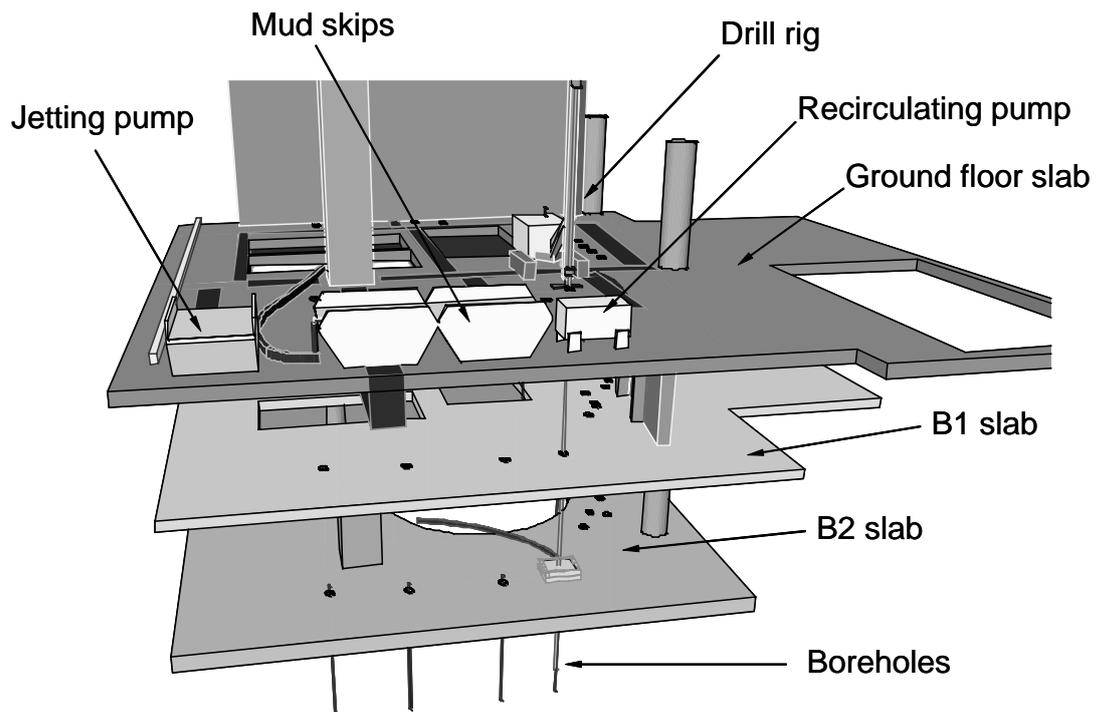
Schematic showing dewatering and instrumentation installation on site.
